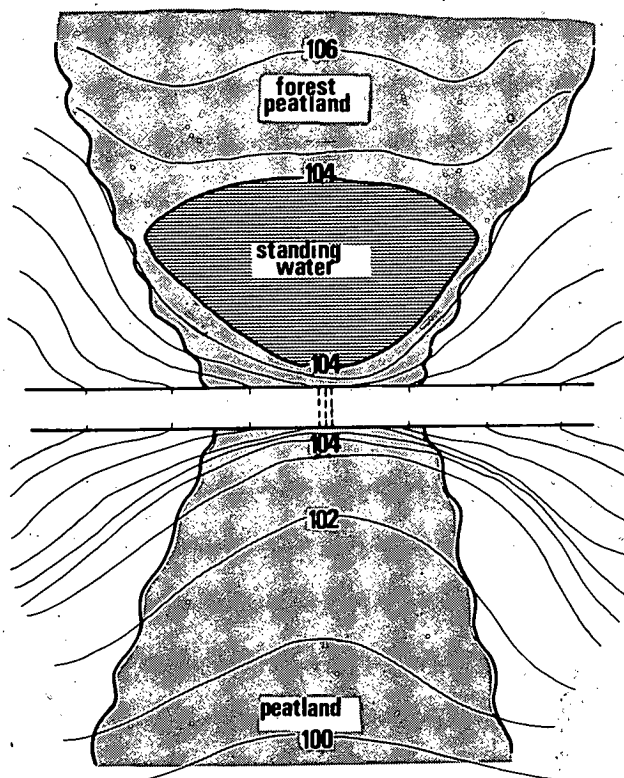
Planimetric view of typical peat wetland crossing area in which flooding occurs (13).
